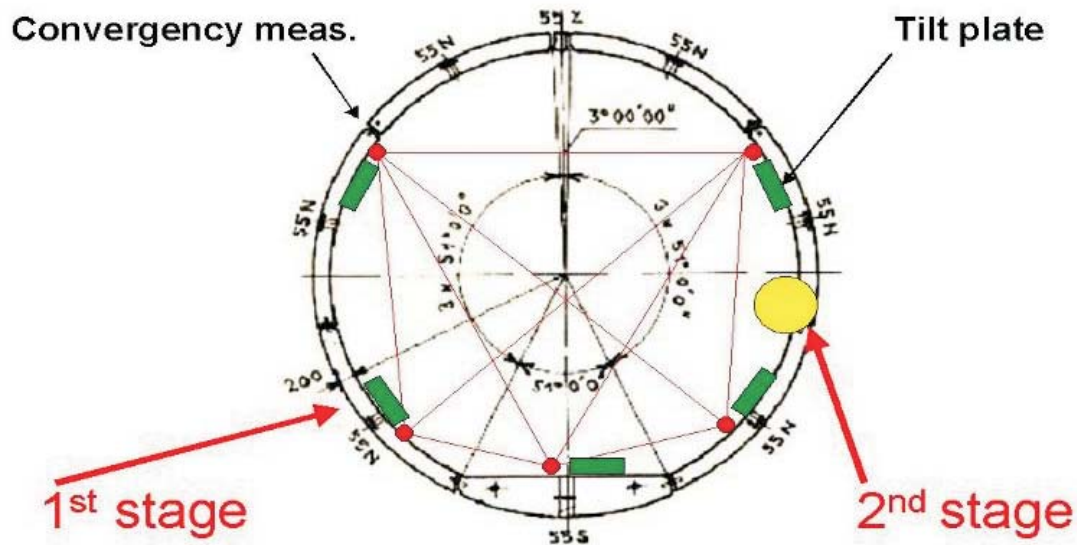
Typical section of the tunnel lining and the placement of bolts and plates (second stage = crack-meters).
